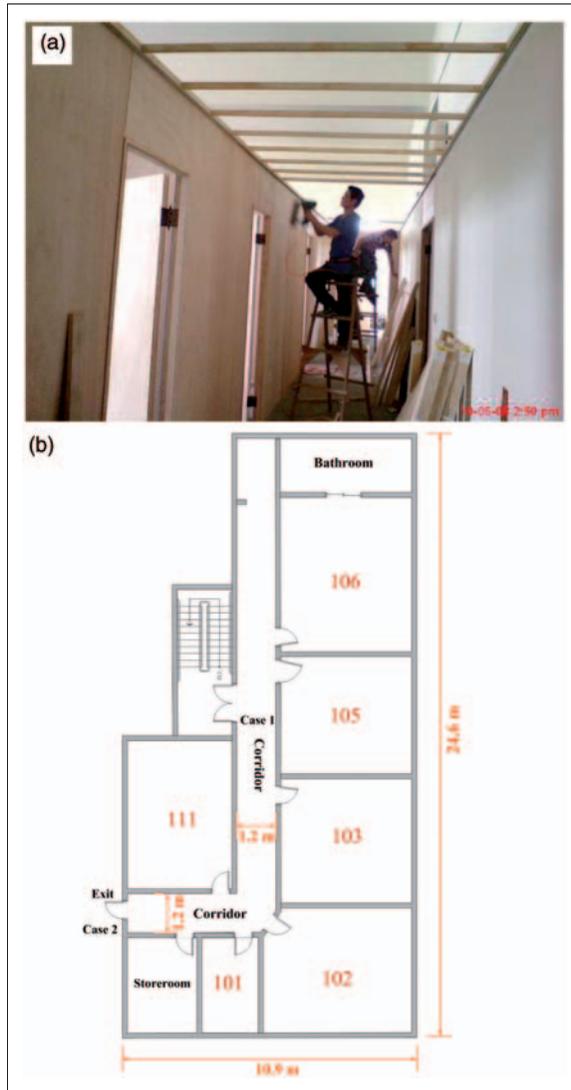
Construction photos and layout of the full-scale tests site. (a) Construction photos. (b) Layout of the full-scale tests site.
